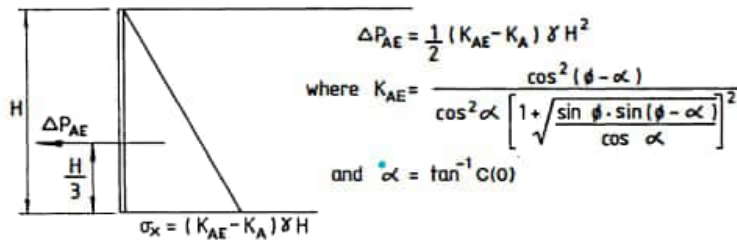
EQ PRESSURE INCREMENT ON FLEXIBLE WALL
